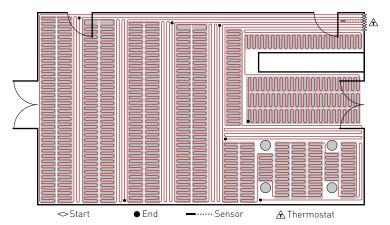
QuickNet floor heating mat layout for comfort floor heating
